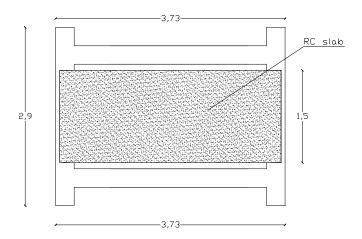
Plan view of masonry specimens: reinforced concrete slab.
